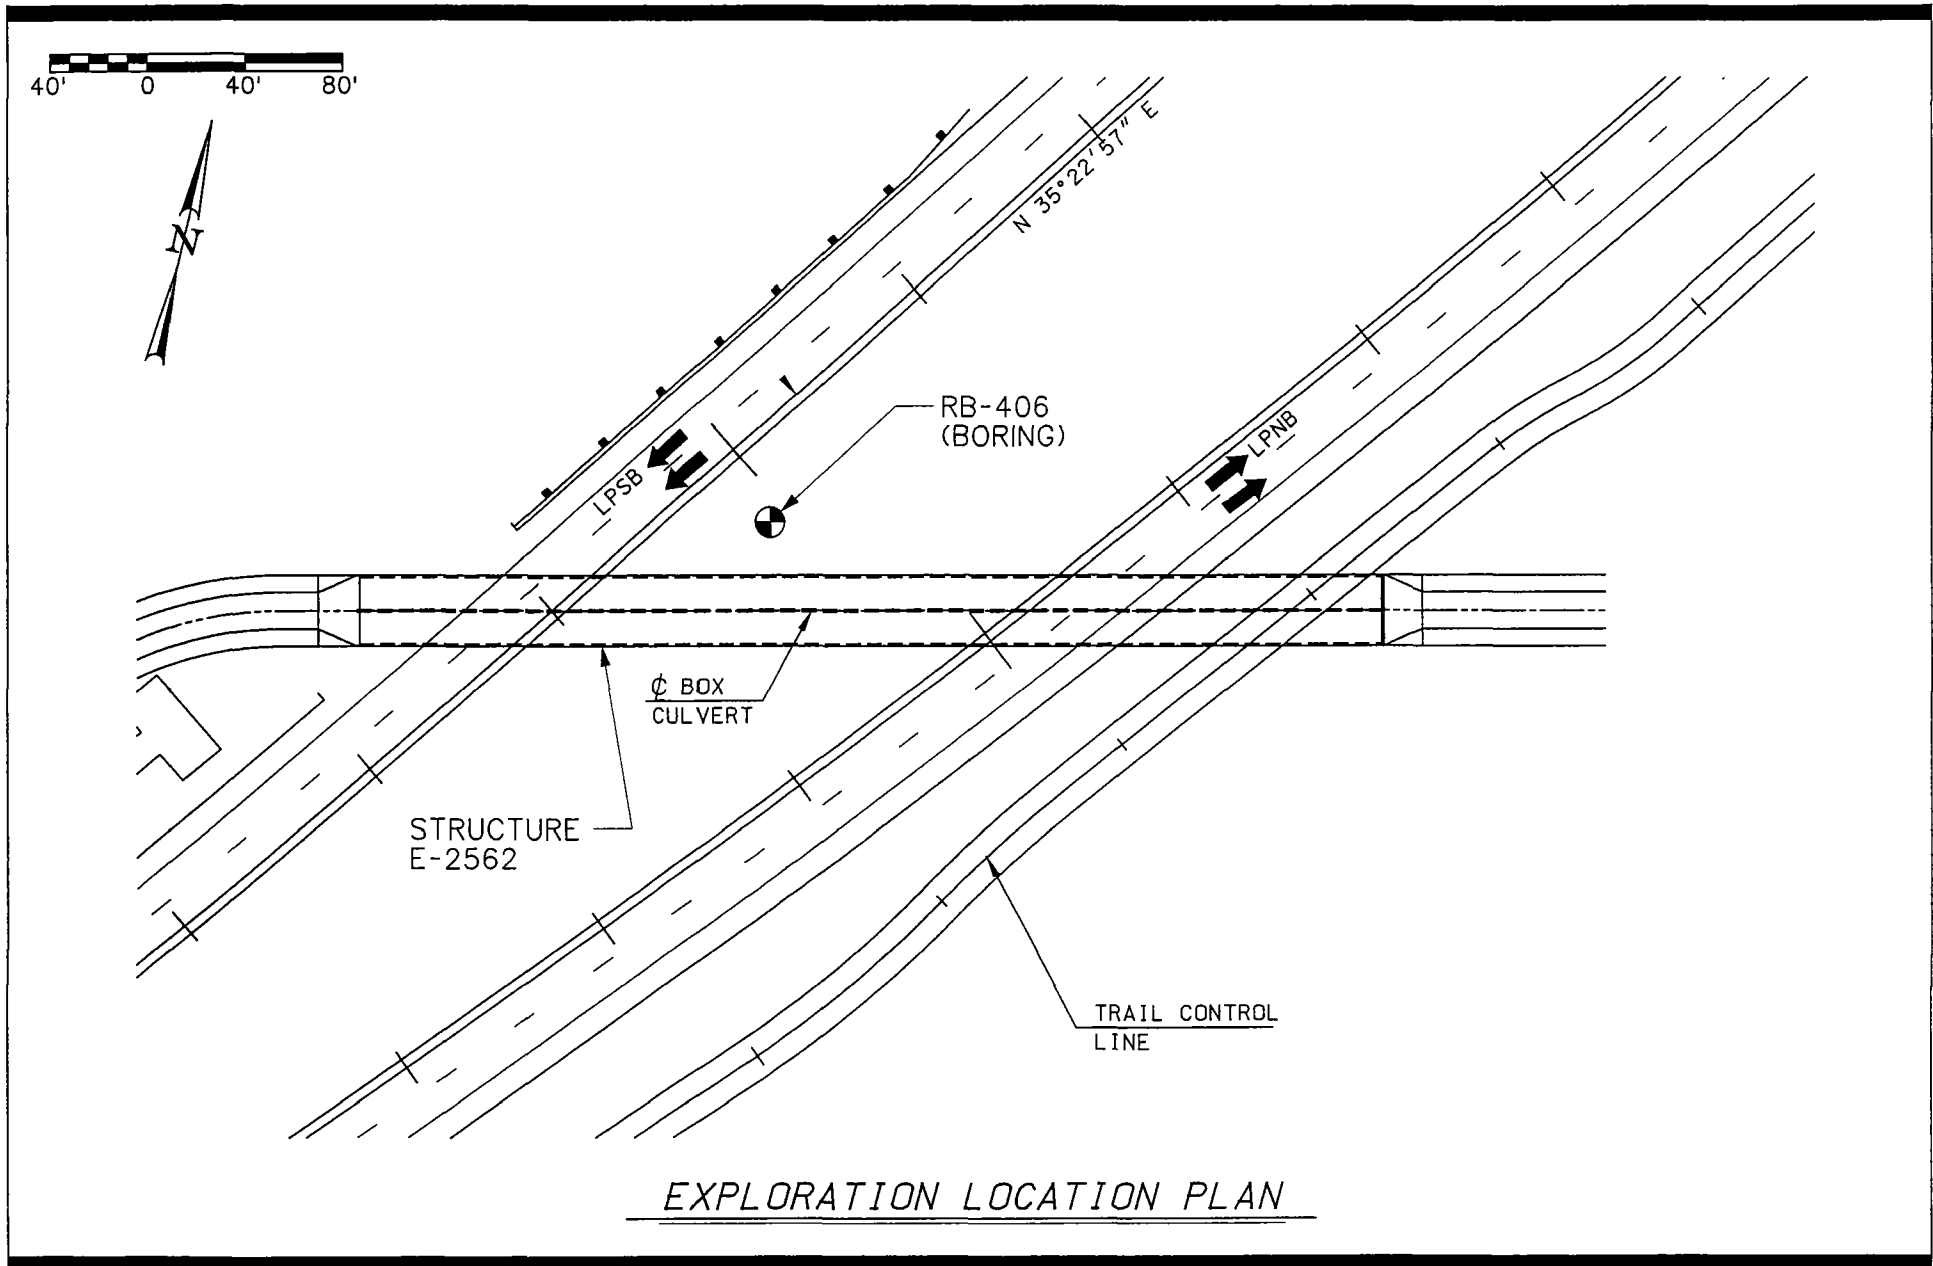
SITE PLAN & TEST HOLE LOCATIONS
